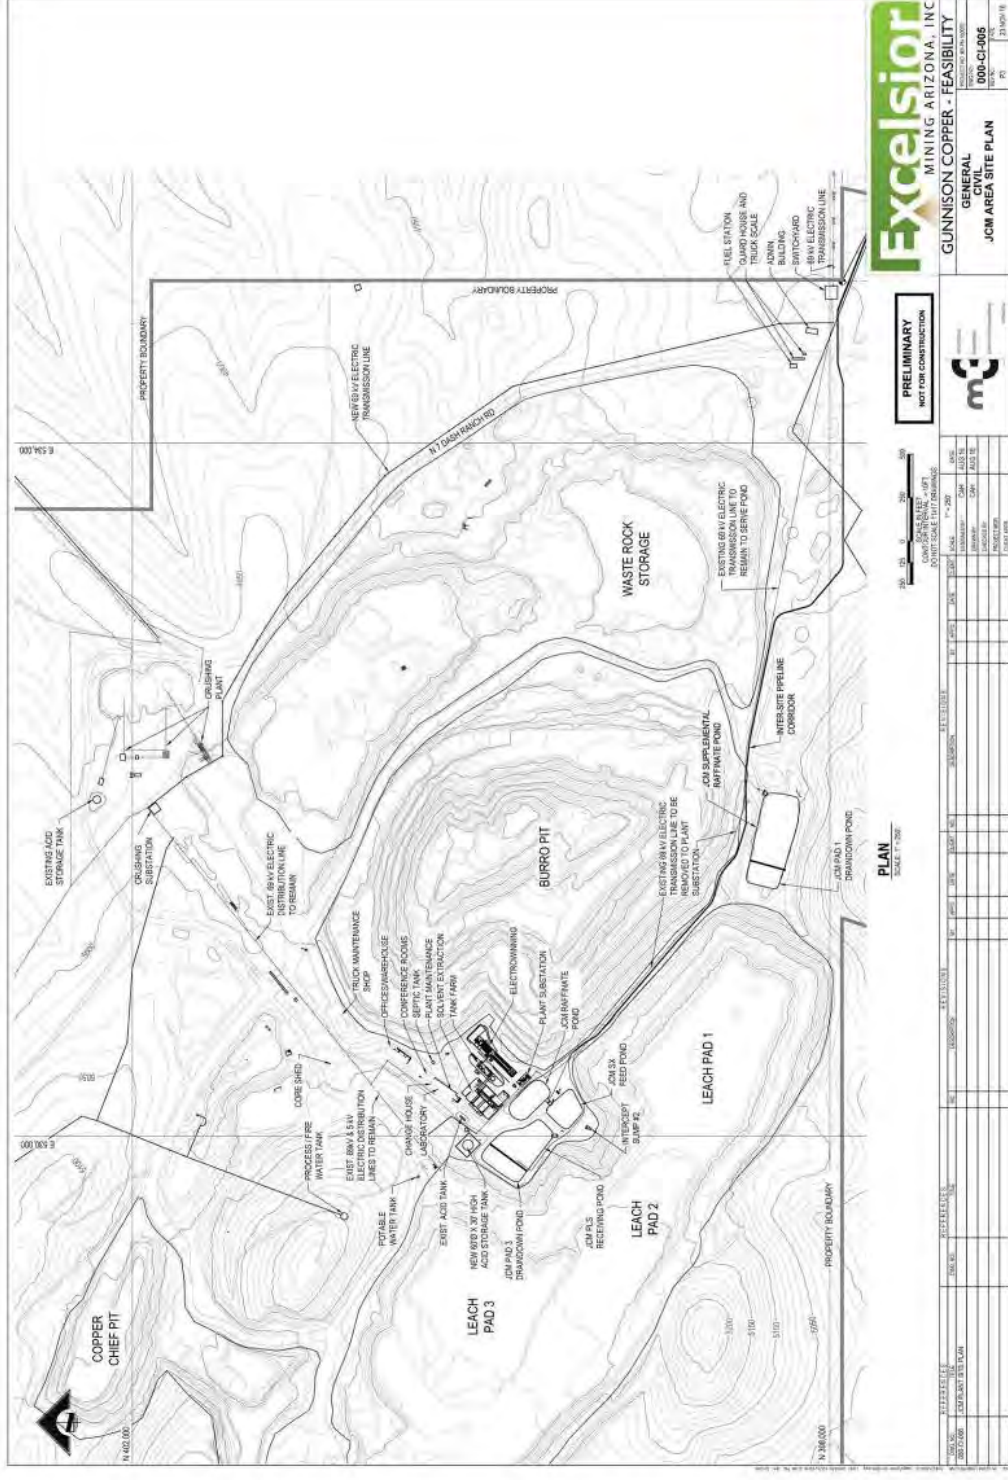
Johnson Camp Mine Facilities Arrangement
